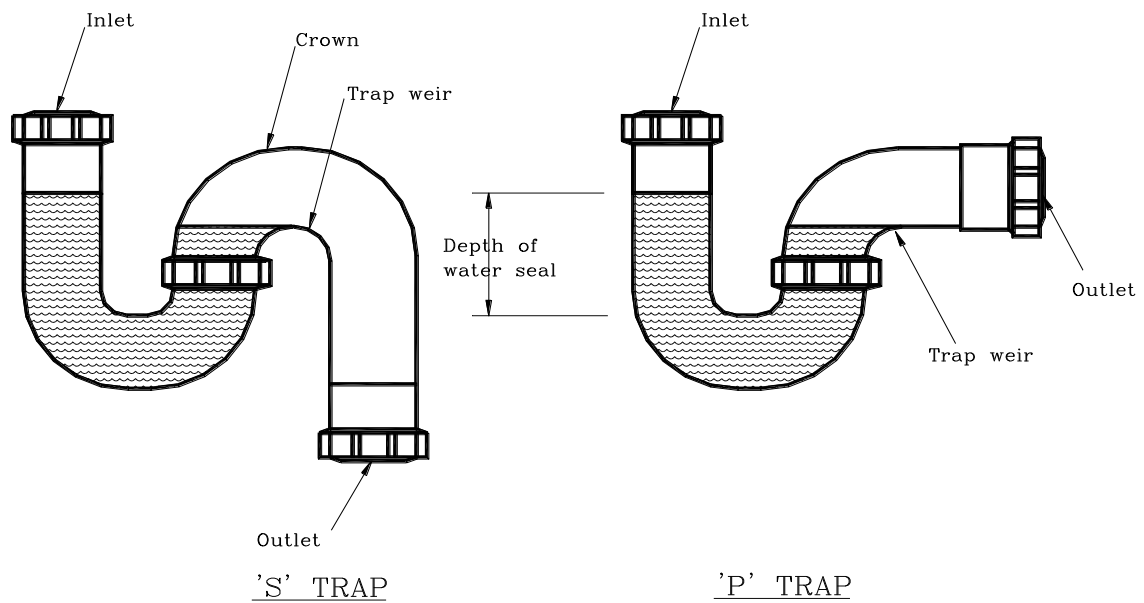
EXAMPLES OF FIXTURE TRAPS
